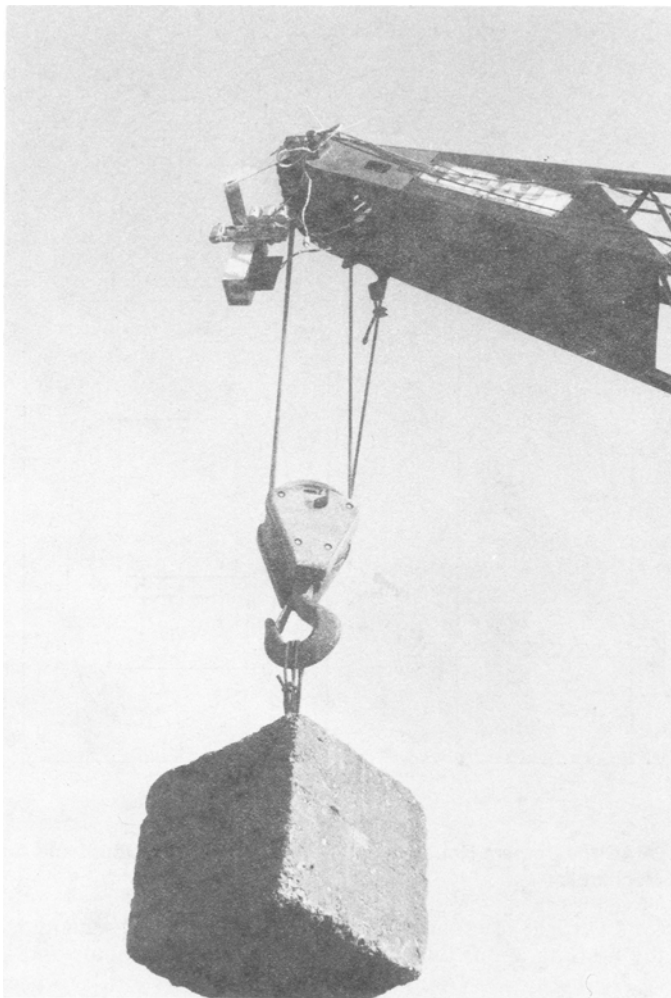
CRANIUM Camera Unit Mounted on Crane Bottom
